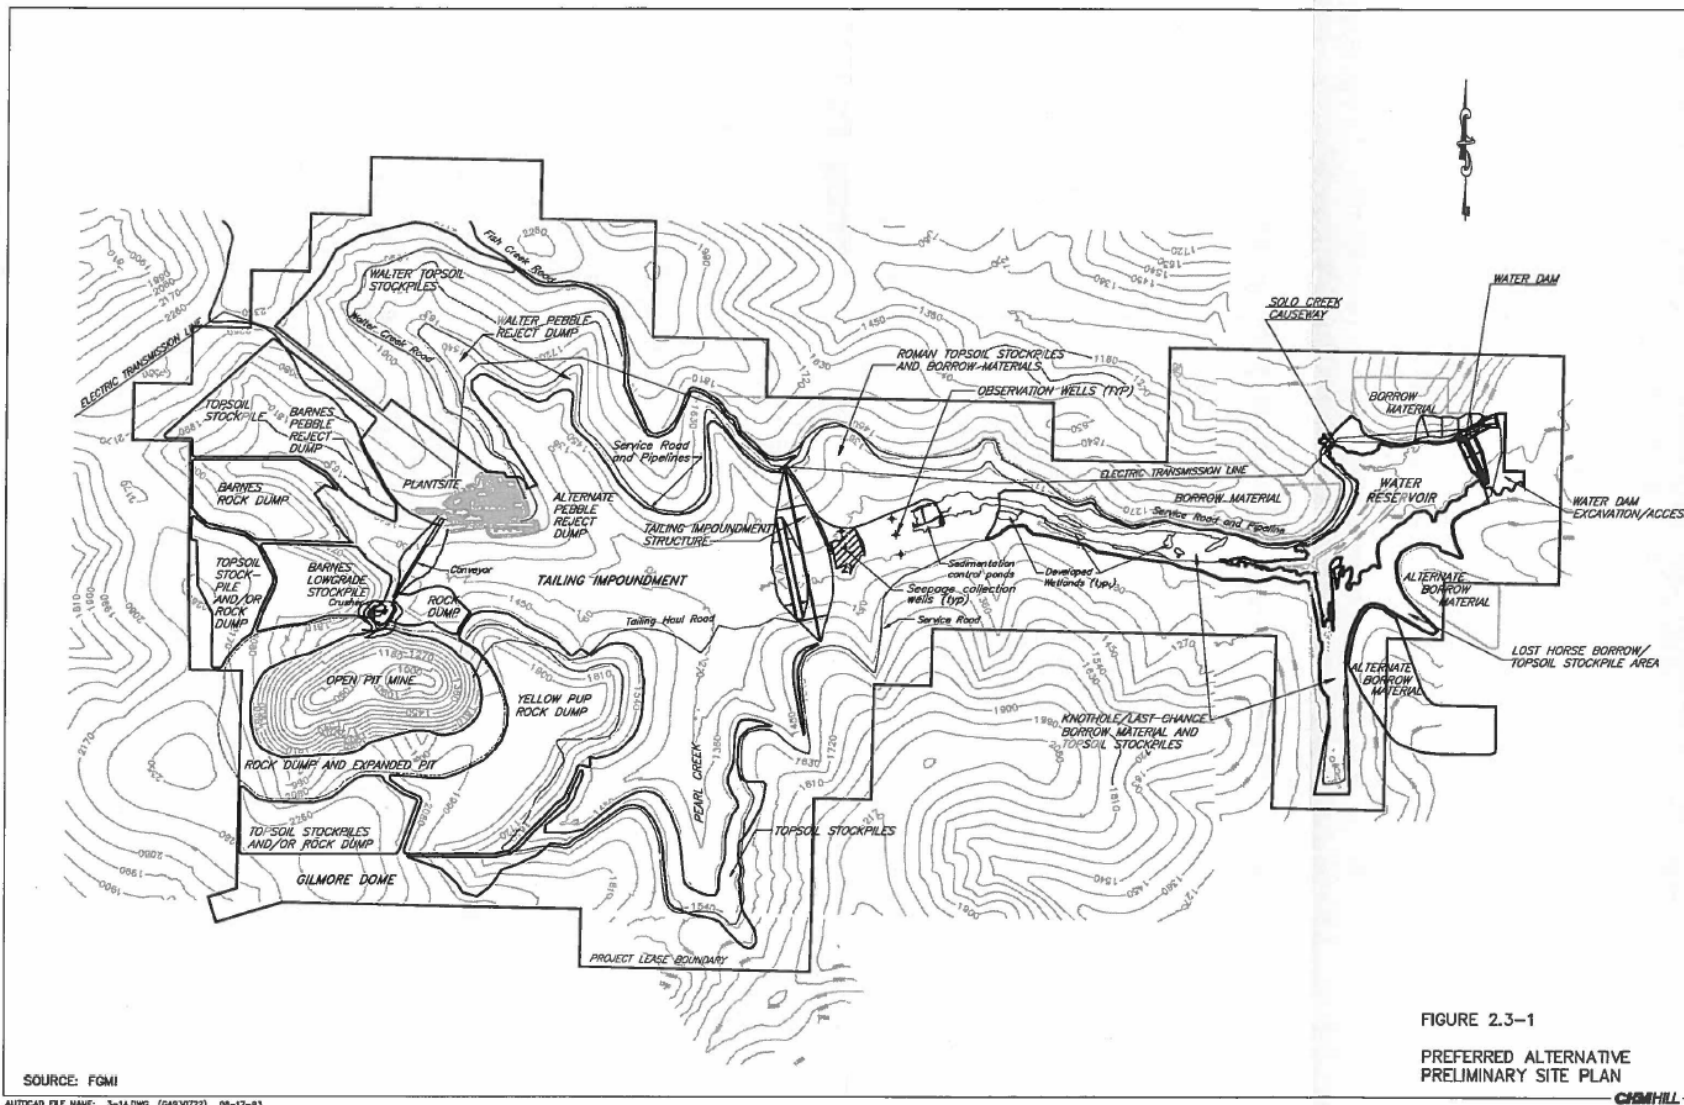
CH2M Hill (1993) Figure 2.3-1 Preferred Alternative Preliminary Site Plan
